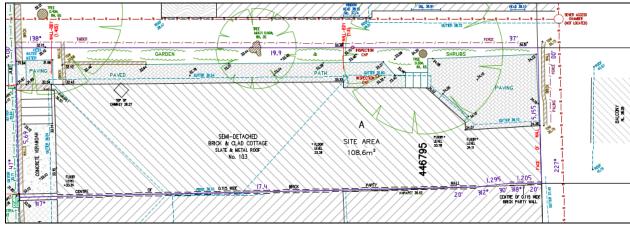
Extract of site survey. Source: Bee & Lethbridge
